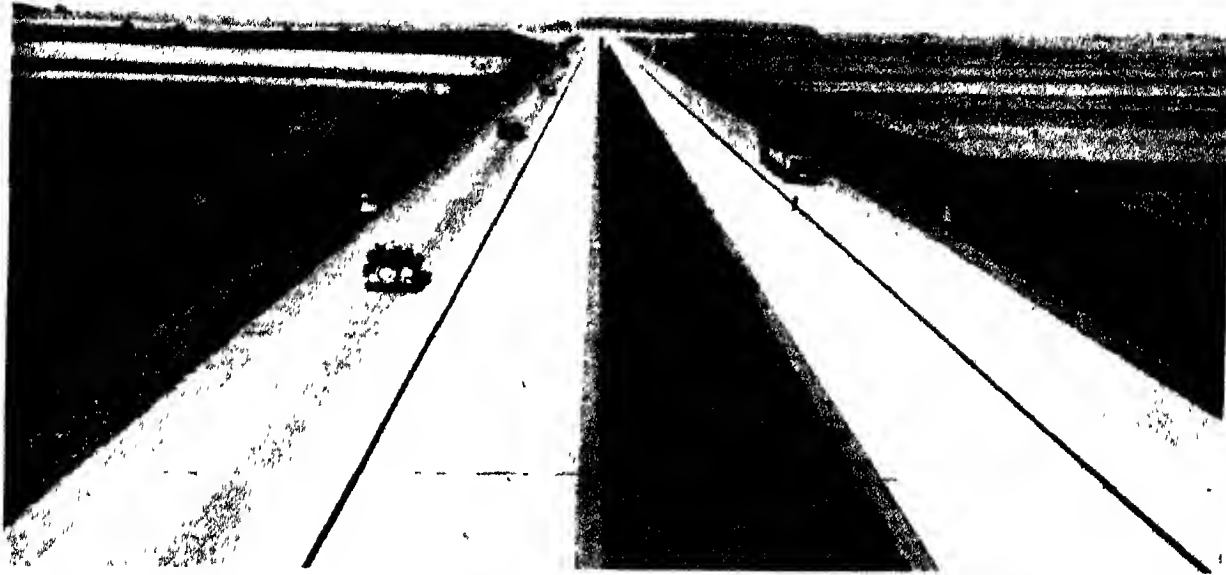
BITUMINOUS BOARD USED AS EXPANSION JOINTING MATERIAL FOR A CONCRETE ROAD
